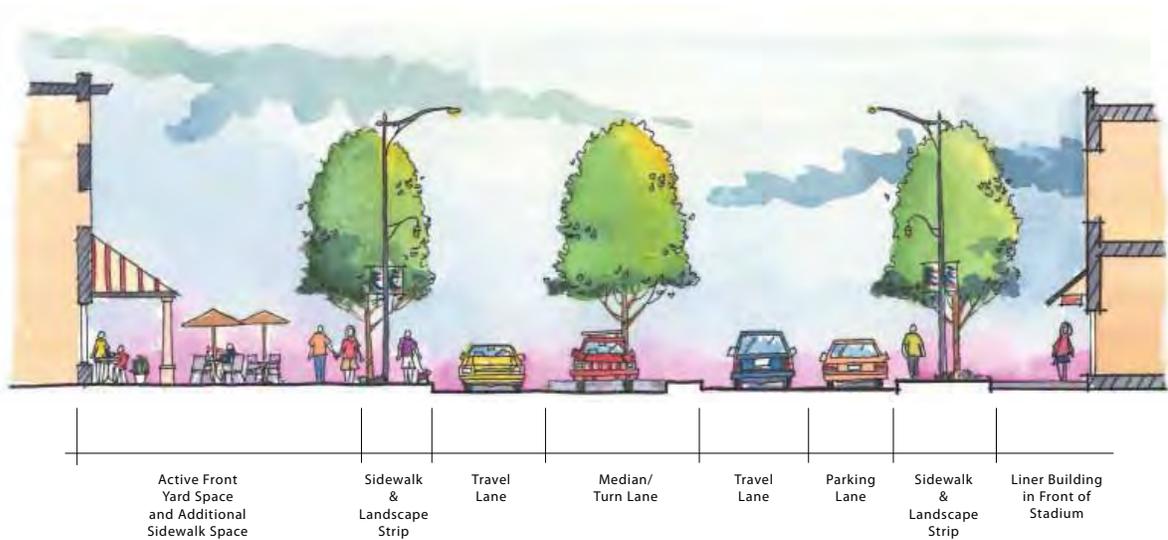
Dunedin Stadium Sub-Area/Roadway Cross Section
